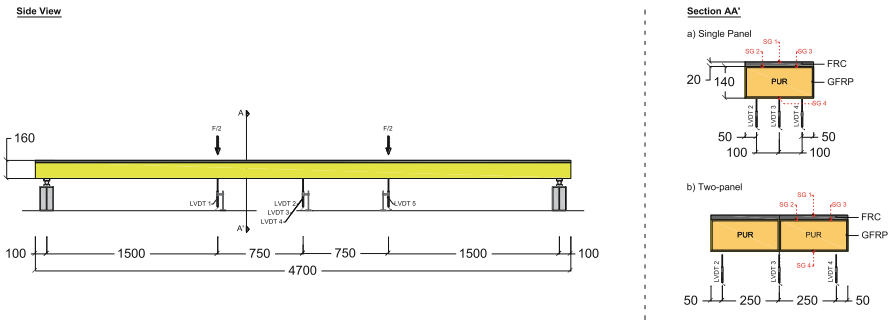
Specimens' geometry and test set-up: (a) Single panel and (b) Two-panel configuration. Units in [mm].
